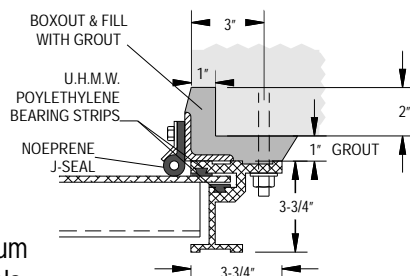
761- Aluminum End-of-Channel Mounting with J-Seals; Section AA
